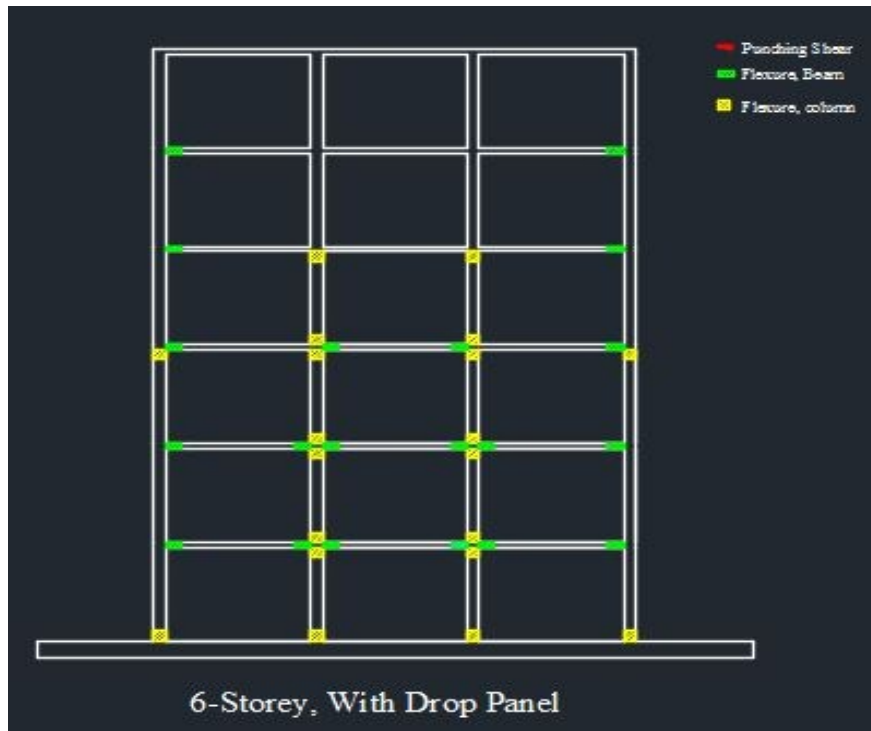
7 : Hinge Formation for 6-Storey Model Building at Collapse Load (With Drop Panel)
